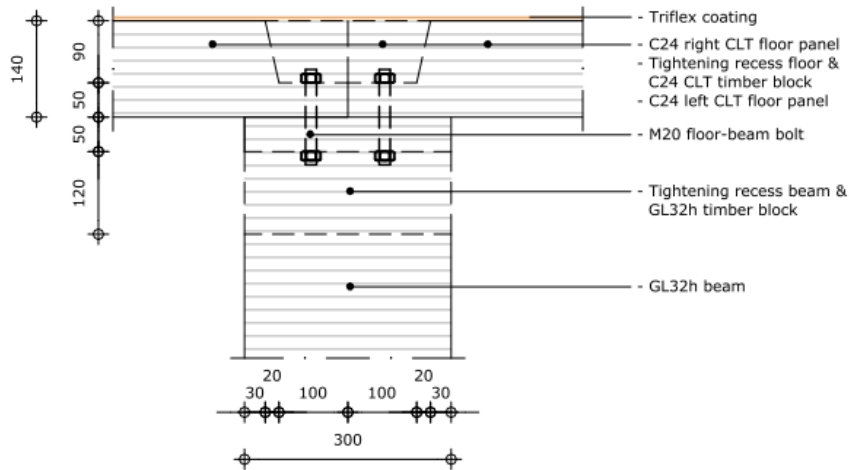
Cross-section C-C final design floor-to-beam connection beam in mm
